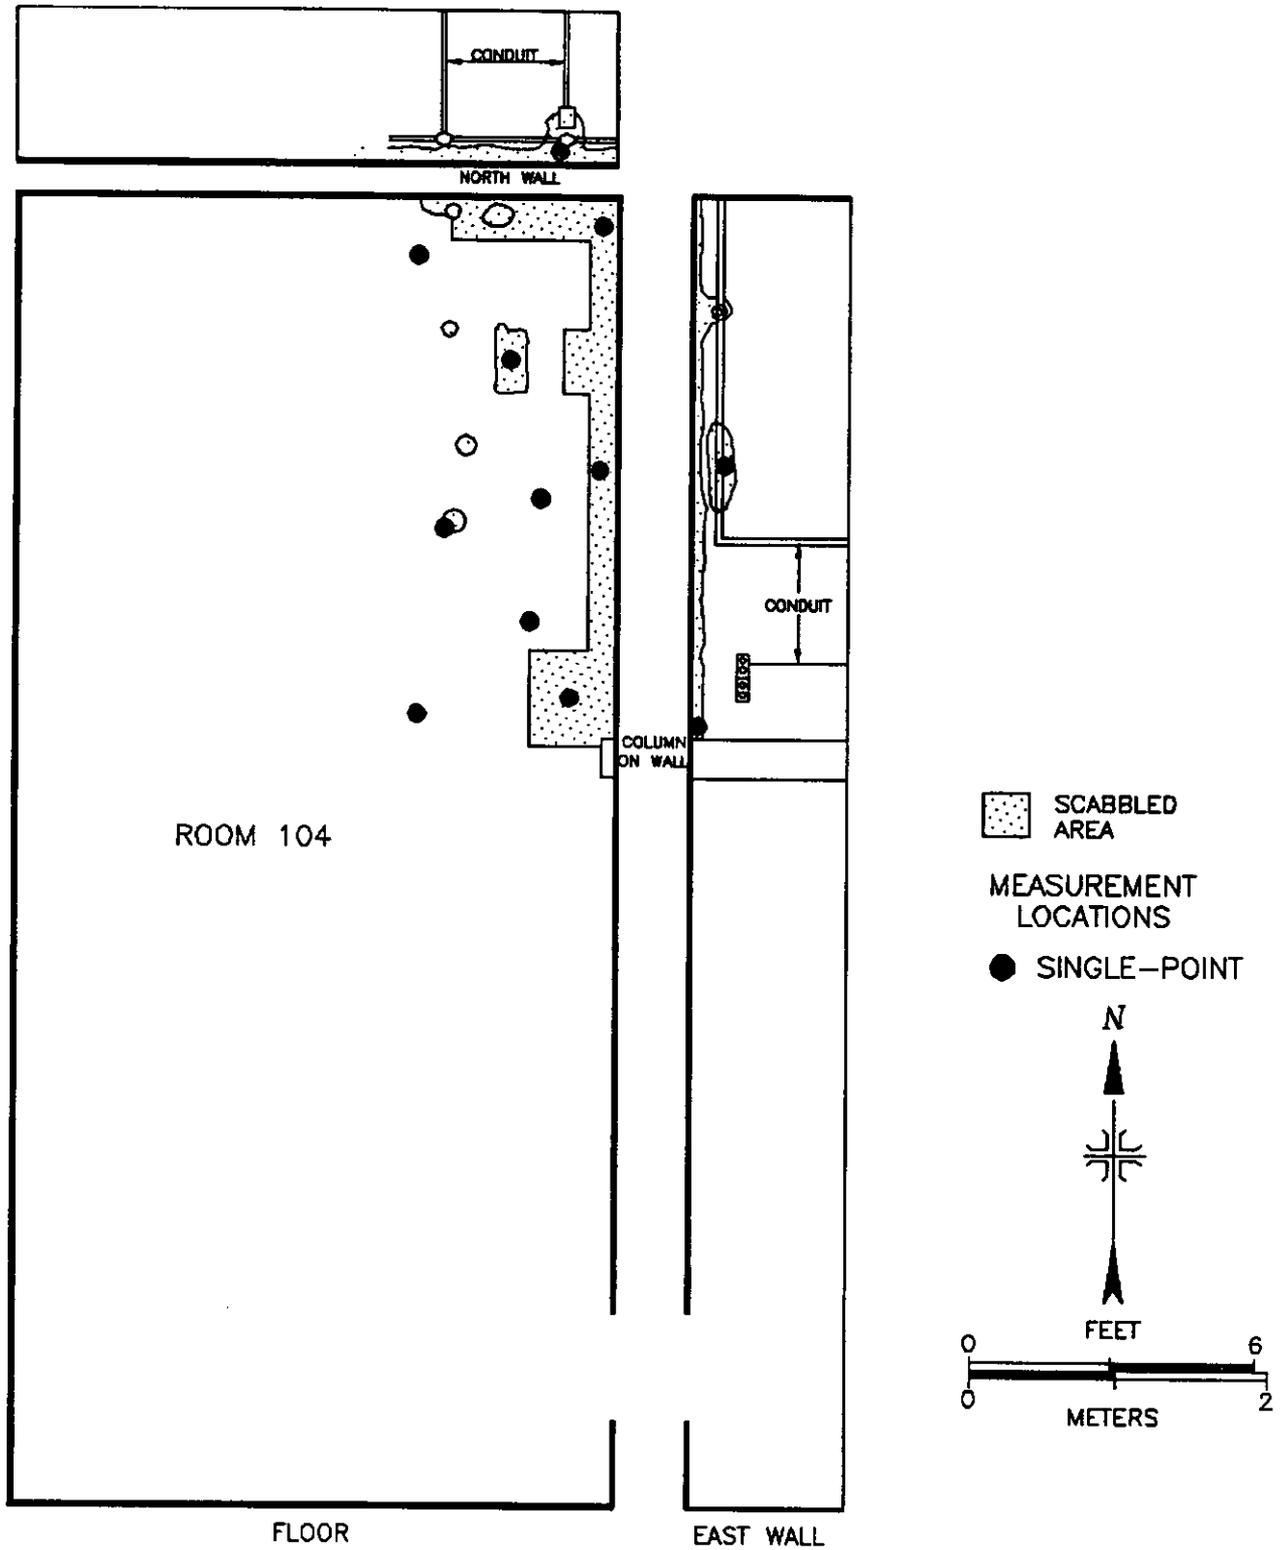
Building 33, Room 104, Indicating Measurement Locations on the Floor and Wall in the Northeast Corner
